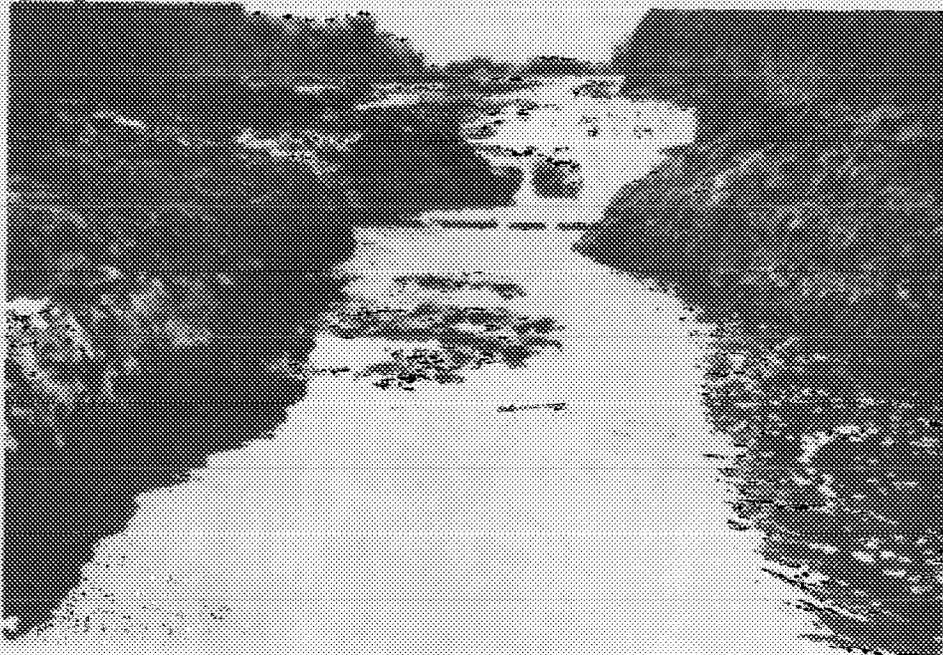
WEIR NO. 7 STA. 61+00 PRIOR TO CONSTRUCTION
